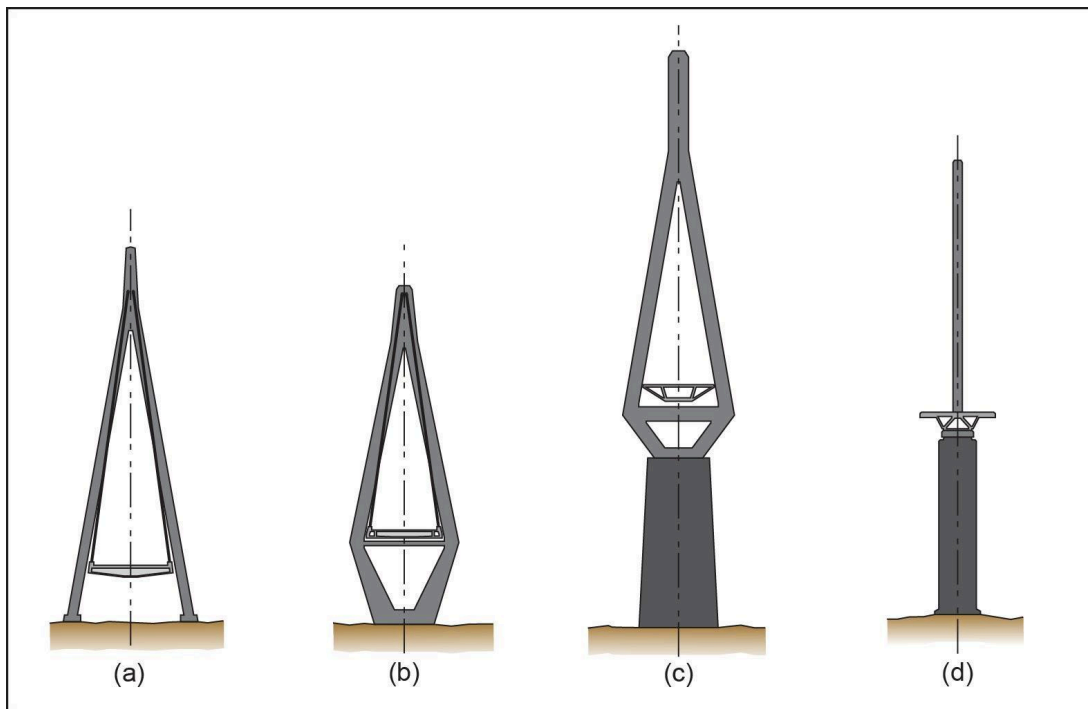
Examples Cable-Stayed Bridge Towers and Pylons: (a) A-Frame Tower, (b) Diamond Tower, (c) Modified Diamond/Delta Pylon, (d) Single Pylon
